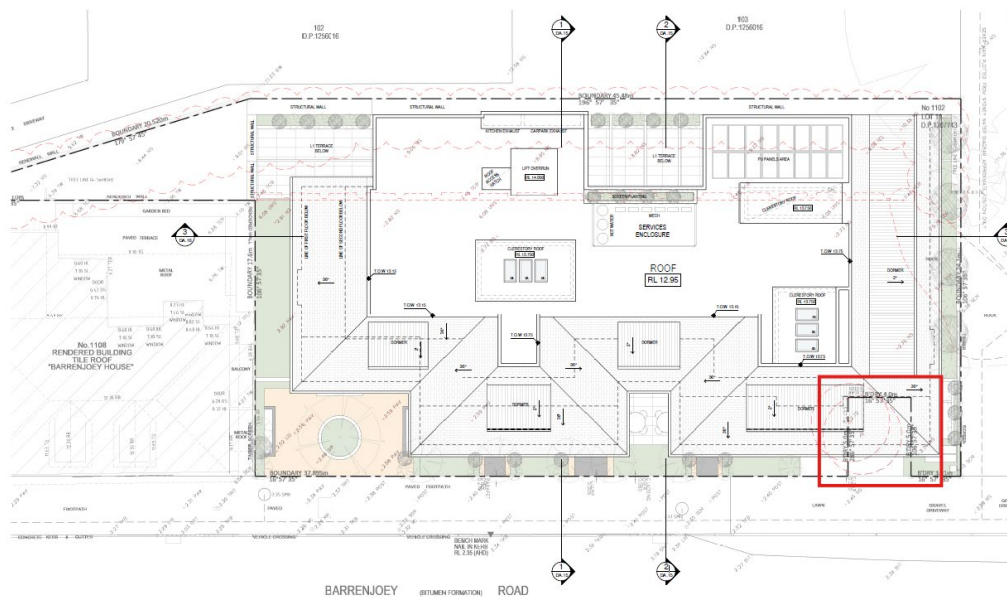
Extract from Architectural plan DA.04 Rev D dated 18/06/2024 (Site Plan)
